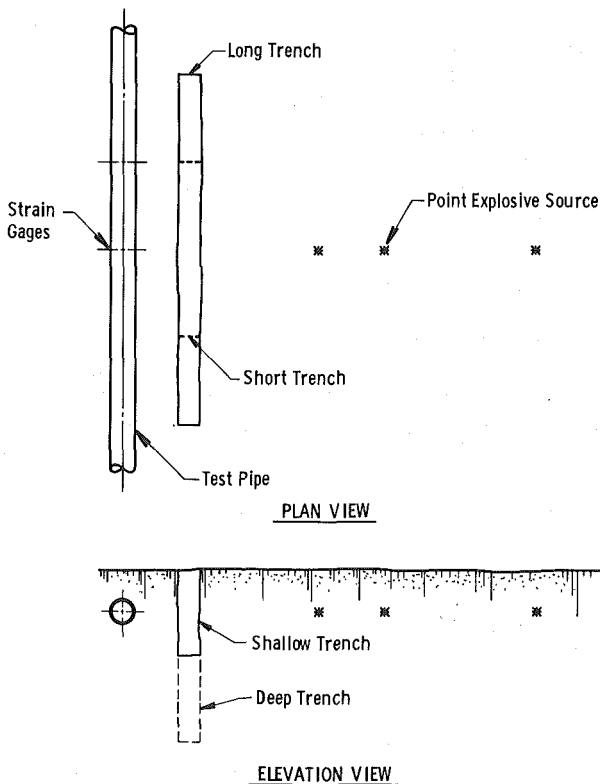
Test Layout for Point Source Experiments with Trenches
